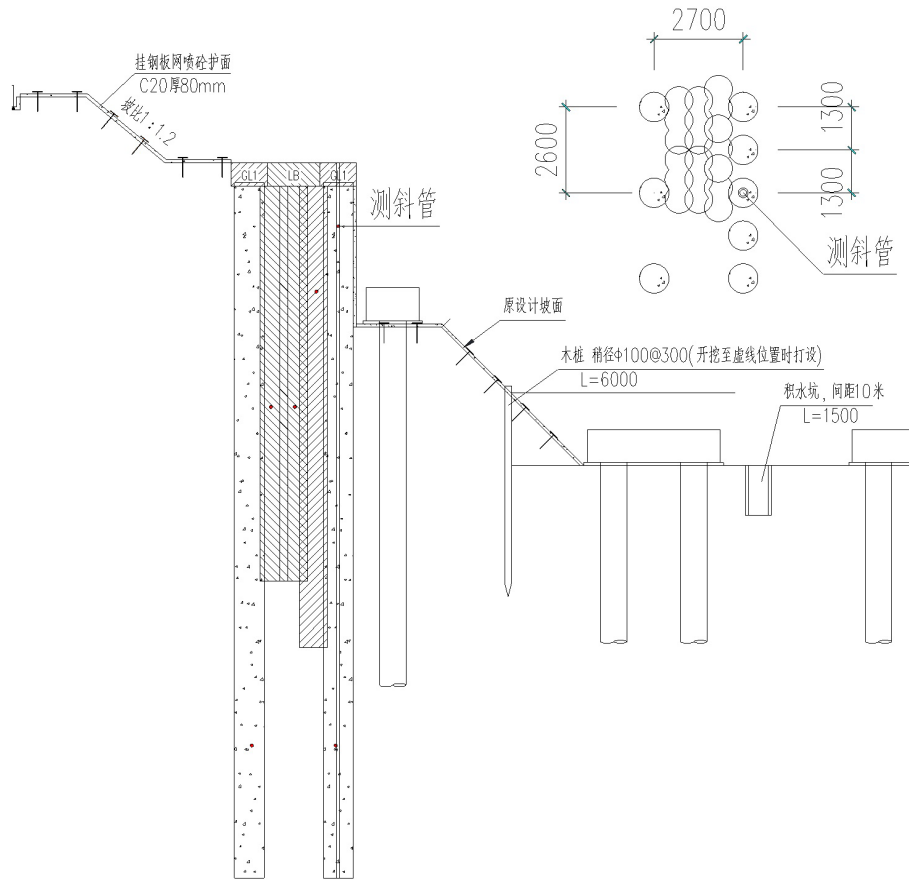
Installation scheme of inclination monitoring for double-row-pile retaining wall
